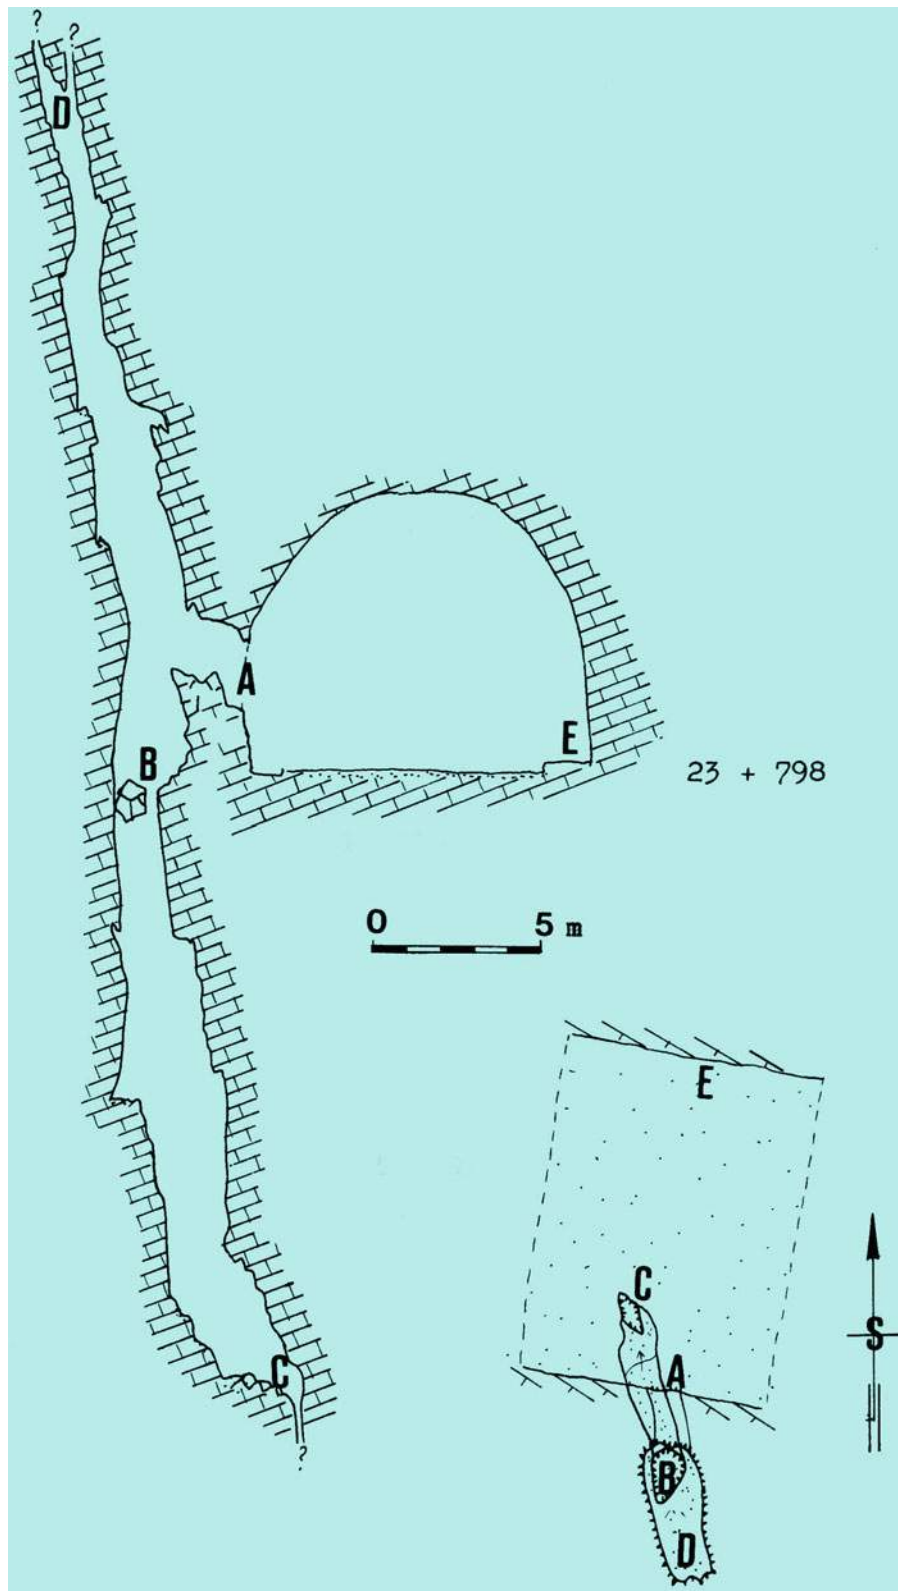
Plan and profile of cavern at km 23 + 798 in Tuhobić Tunnel
